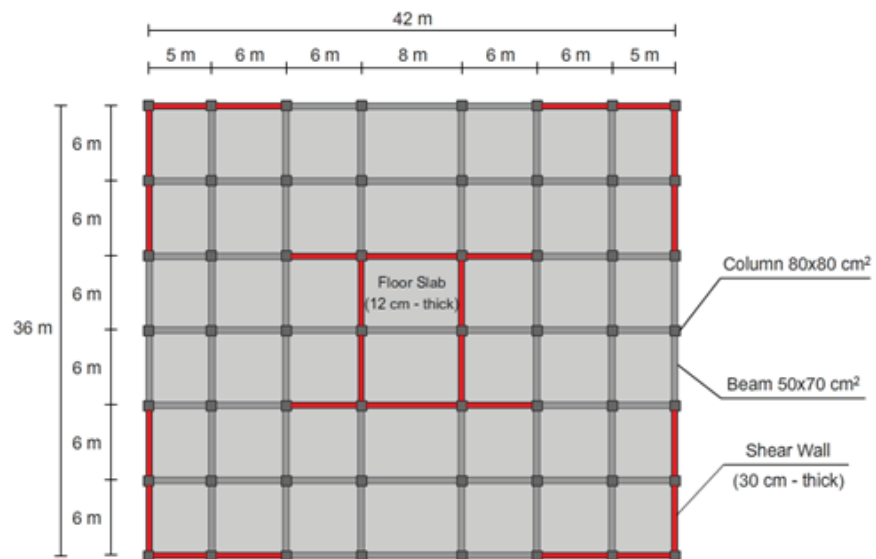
Floor Plan of Reinforced Concrete Building Model.
